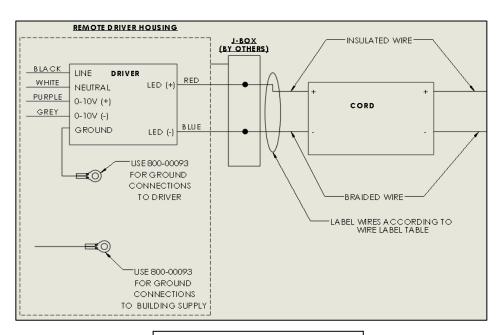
WIRE DIAGRAM A (FOR 1 DRIVER)
